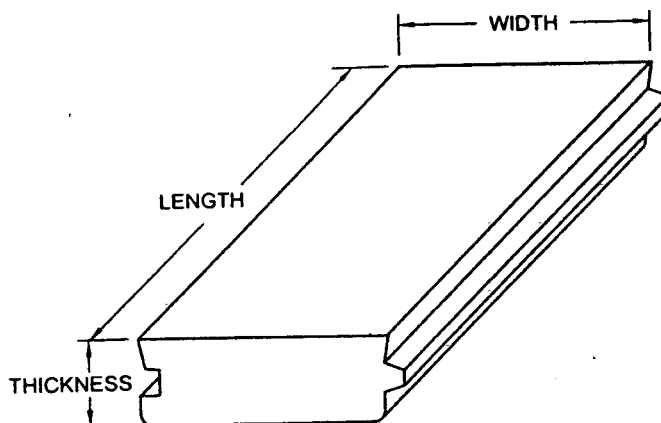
ILLUSTRATING DIMENSIONS OF FLOOR AND ROOF SLABS
